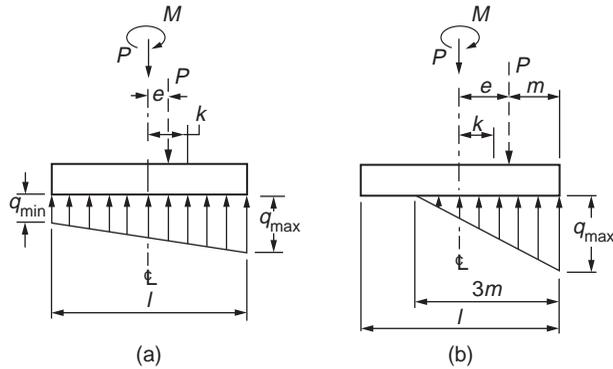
Assumed bearing pressures under eccentric footings. (Source: Wang and Salmon, 1985.)
